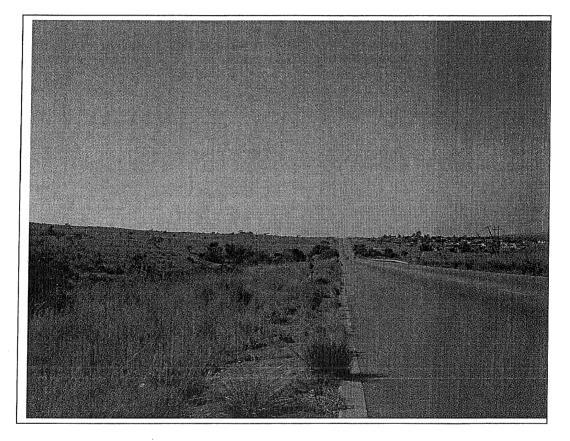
The last stretch of the Preferred Route runs along the northern shoulder of Road 573 before jumping this road to join the Kwaggafontein Substation (above).
